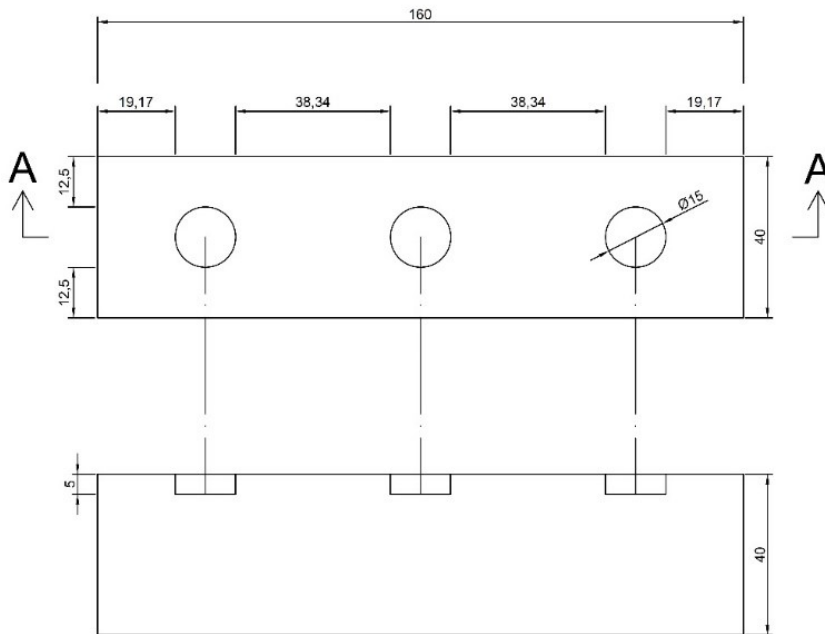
Scheme of a sample tested with the penetrometer and geometrical disposition of the bit prints. Dimensions expressed in mm.
